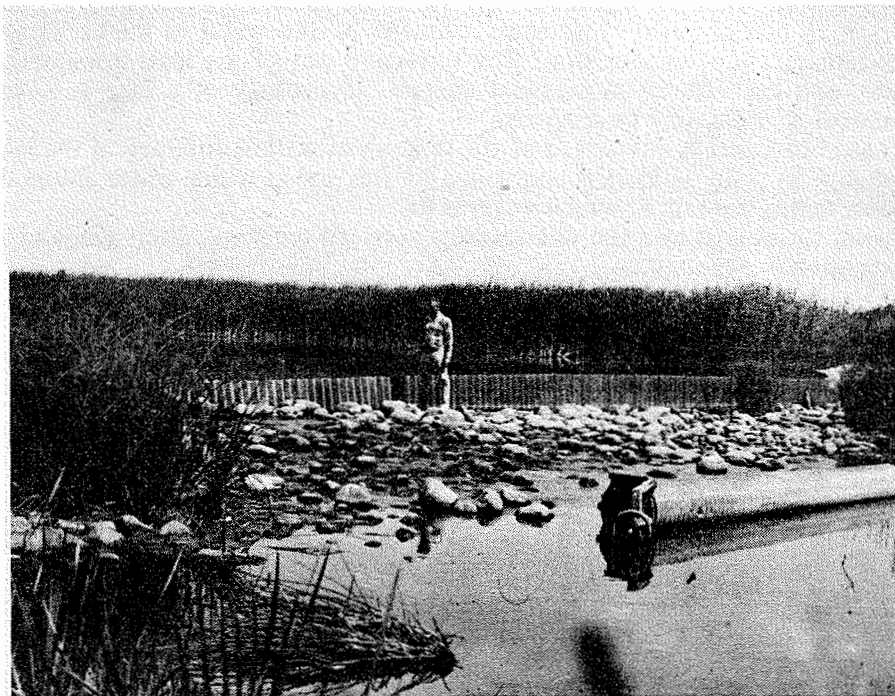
Photograph showing the remains of a dam constructed in 1941.
